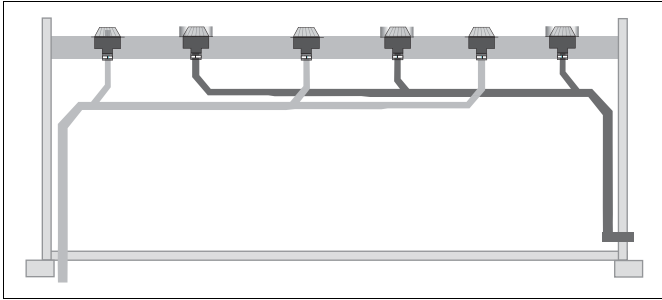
Siphonic roof drainage system with siphonic emergency overflow (not connected to sewer)
